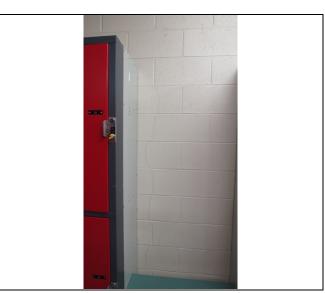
A1031 Crack in CMU at GL's 9.1 & M
